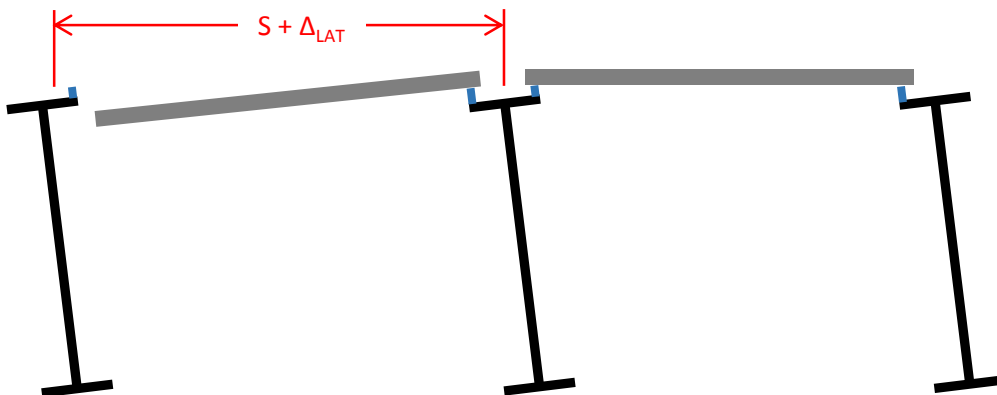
Separation of I-Girders during Construction away from Intermediate Cross-Frame
